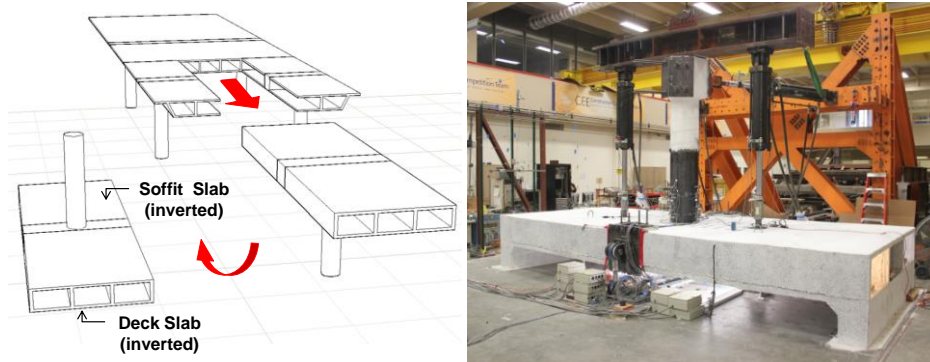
Inverted test specimen development and box-girder slab terminology (left); overview of the test setup and boundary conditions shown for the second specimen (SP2) HS test (right)
